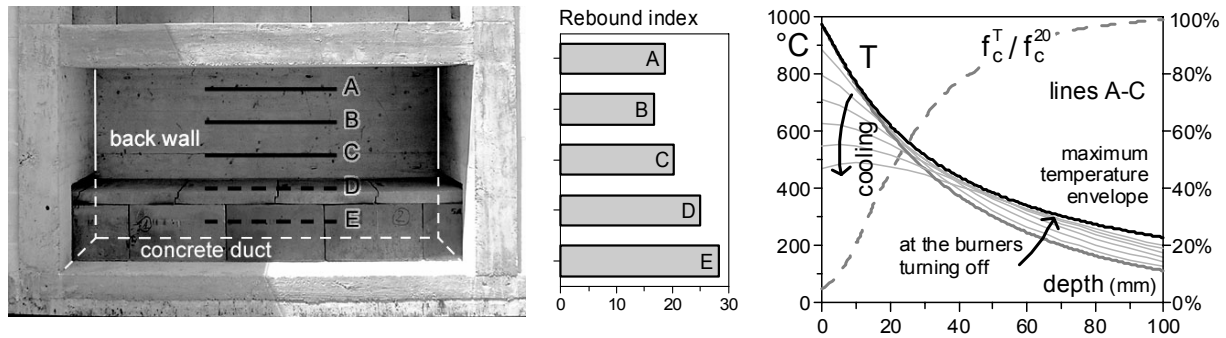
Fire-test setup including the concrete duct to be tested and the back wall which has been the object of ND testing; rebound hammer response of the wall after testing and maximum temperature envelope in the exposed part of the wall.
